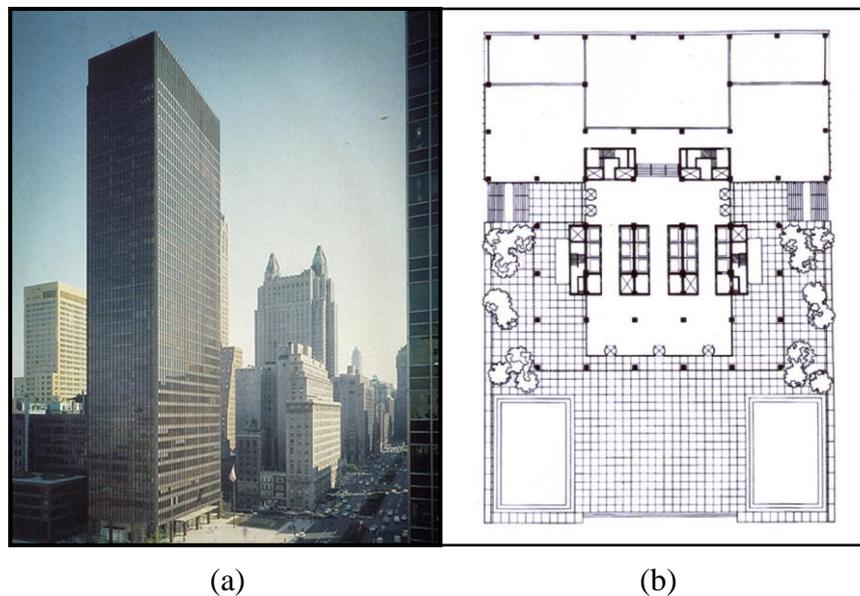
Seagram Building, New York, 1957. (a) General view; (b) Plan (Image Source: www.moma.org)
